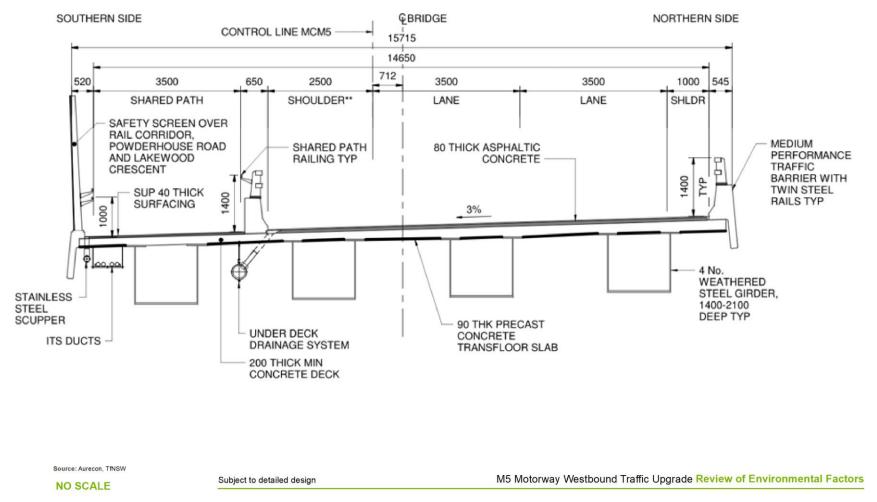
Cross section at span 6 of the new bridge over the Georges River
